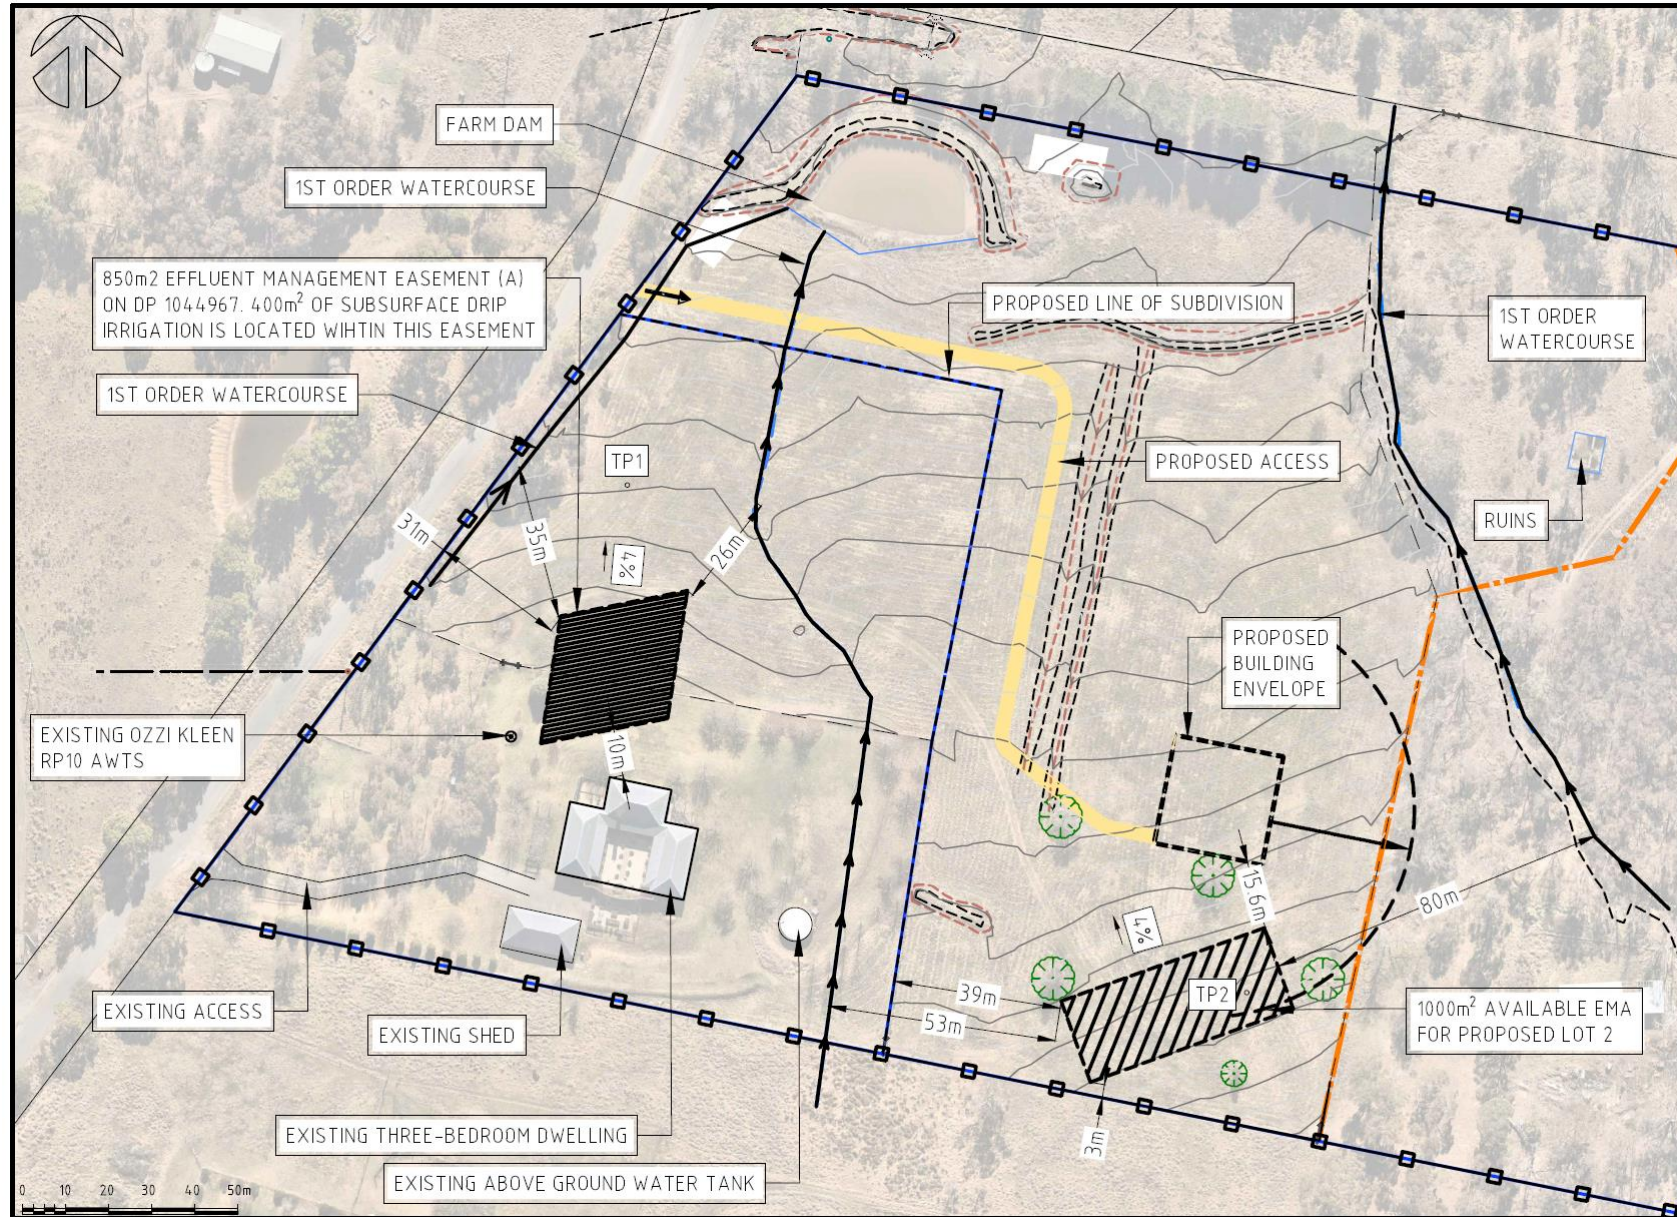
Site plan showing the available EMAs and Building Envelopes (BEs) (Proposed Lot 1 and 2).
